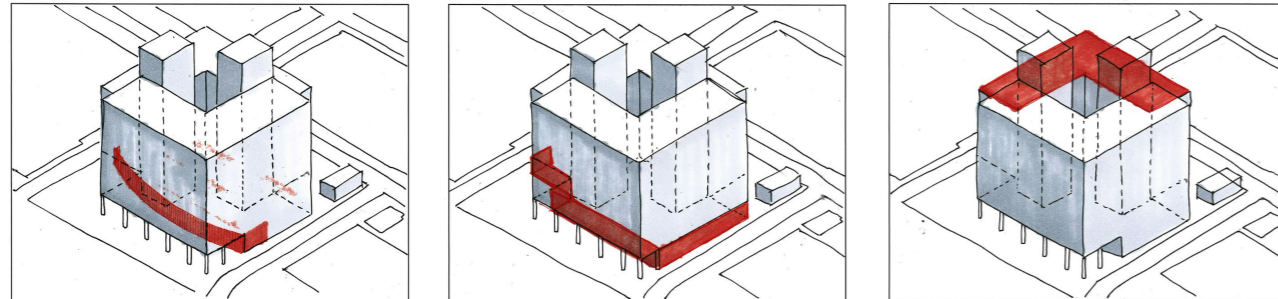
Ground floor facade interventions: removing current facade, adding a new facade, adding a new green roof (Lars Haga, 2026)
